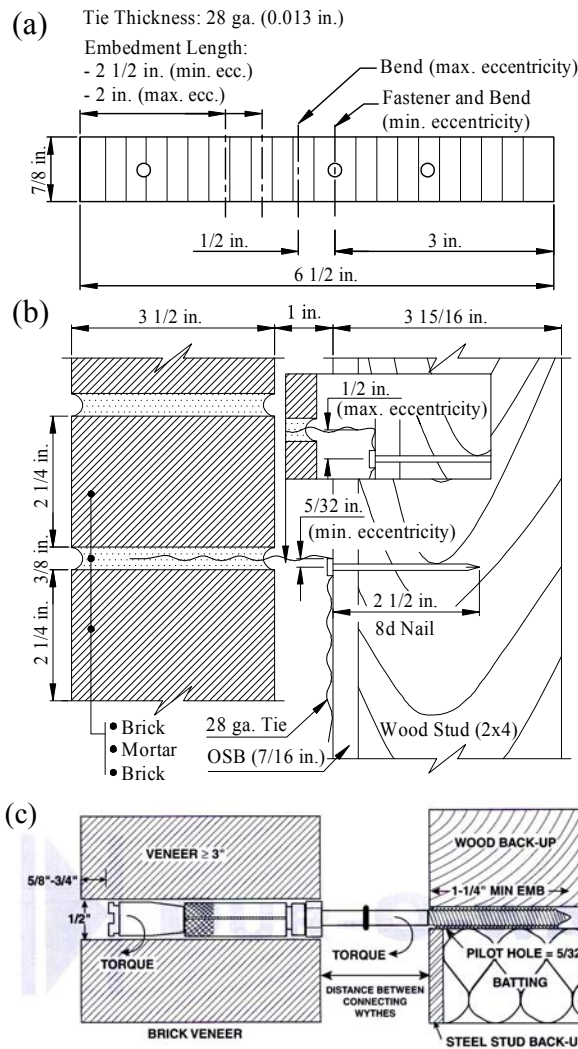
Corrugated sheet metal tie (28 ga.) (a) overall dimensions and (b) section view of installation with 90-degree bend located at the nail and at an eccentricity above the nail. (c) Post-installed Series 5300 Dur-O-Wal mechanical anchors for Wall-2b (Dur-O-Wal 1998).
